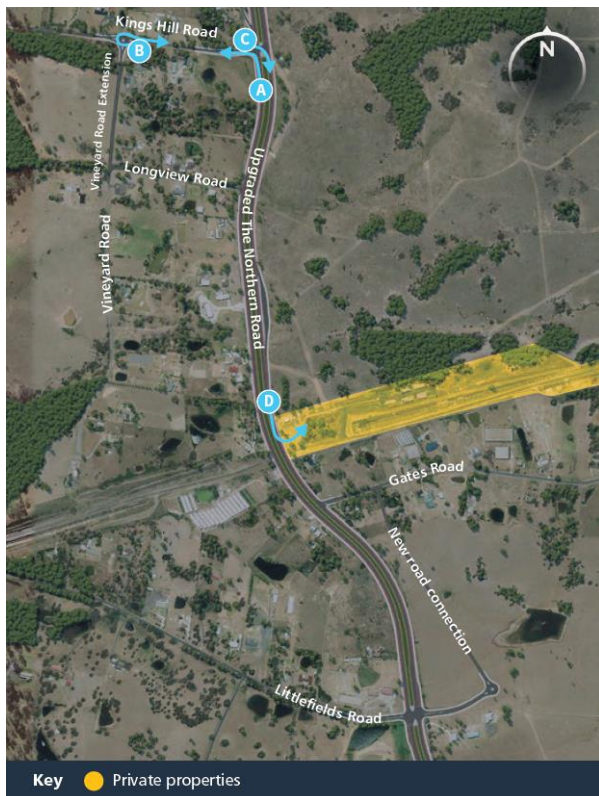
Alternative access arrangements for properties between Littlefields Road and Longview Road
